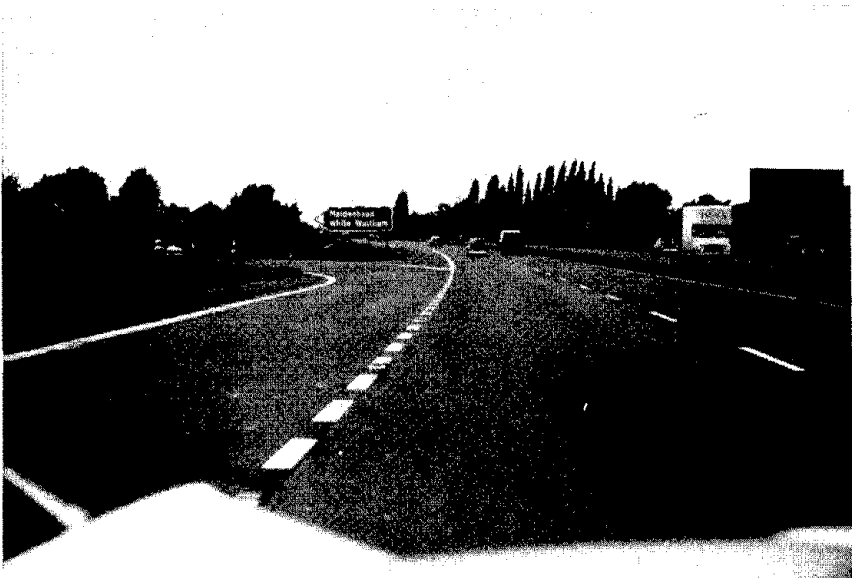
Pavement Markings at Lane-Drop Exit Ramp, England.
